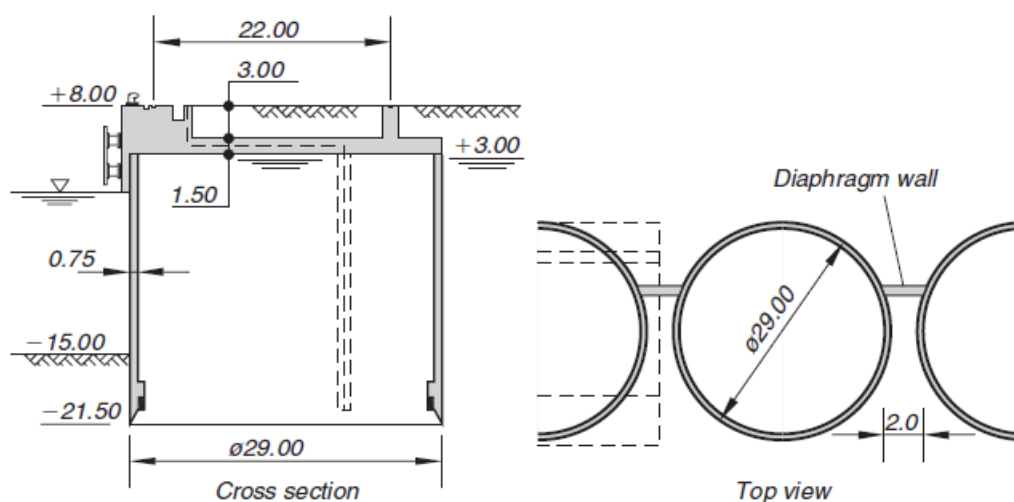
Cross-section of a cellular quay wall (de Gijt & Broeken, 2013).
